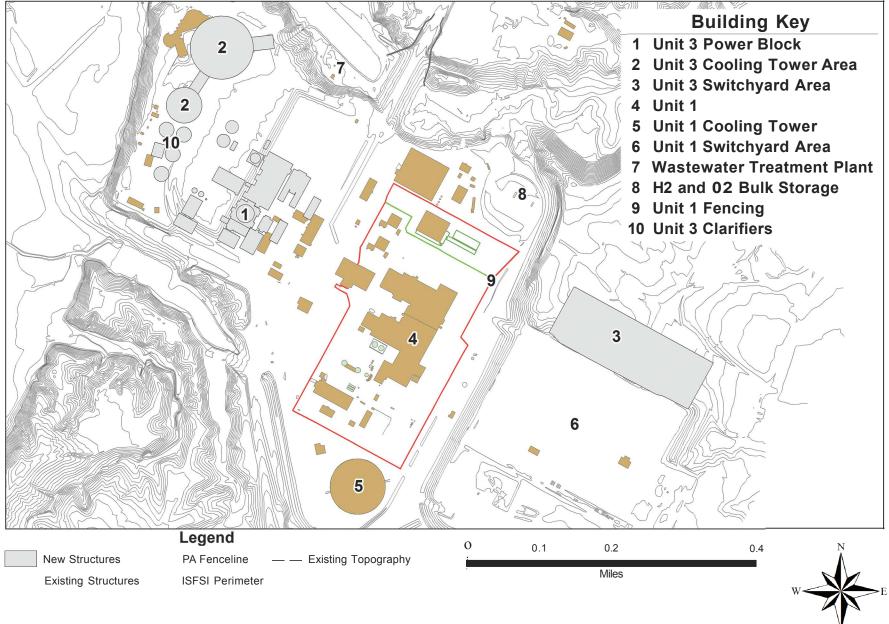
Detailed Site Plan and Location of Existing Structures
